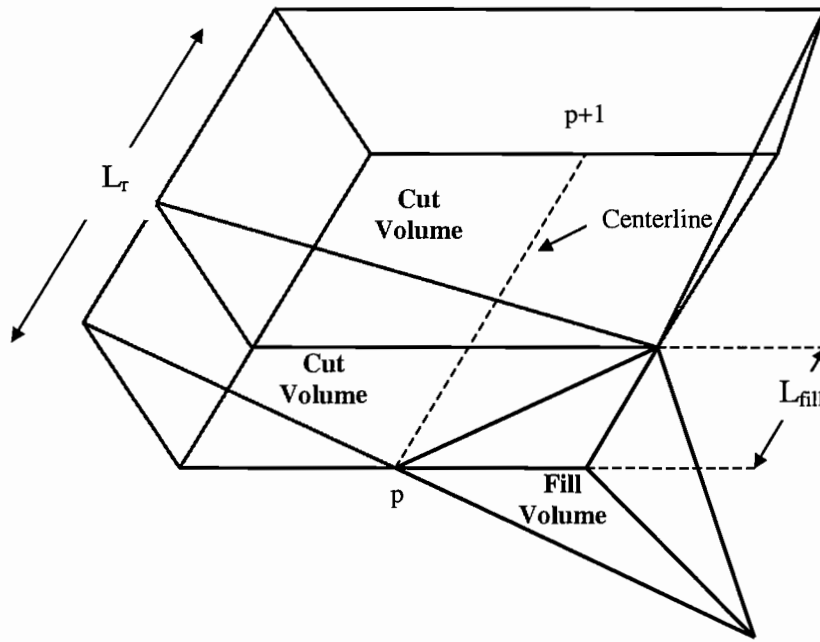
Earthwork Volume: cut and fill section to through cut section.
